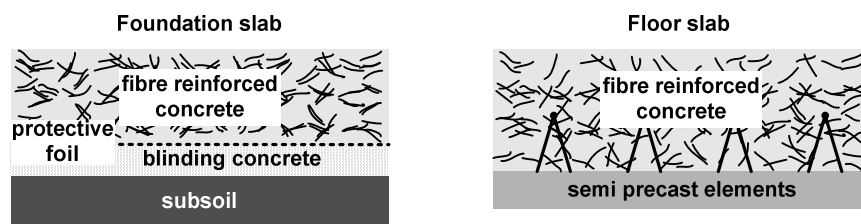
Rationalization through the use of standardized building materials (e.g. use of steel fibre reinforced concrete in foundation and floor slabs) and prefabricated components (e.g. semi precast floor slab elements)
